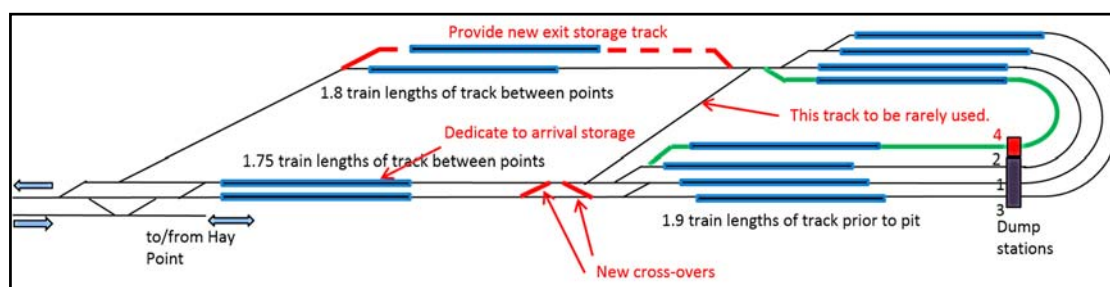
Proposed 8X rail loop modifications shown in red as proposed to be constructed with the IL4 dump station. The fourth rail loop in green would be constructed only at the later 9X stage.
